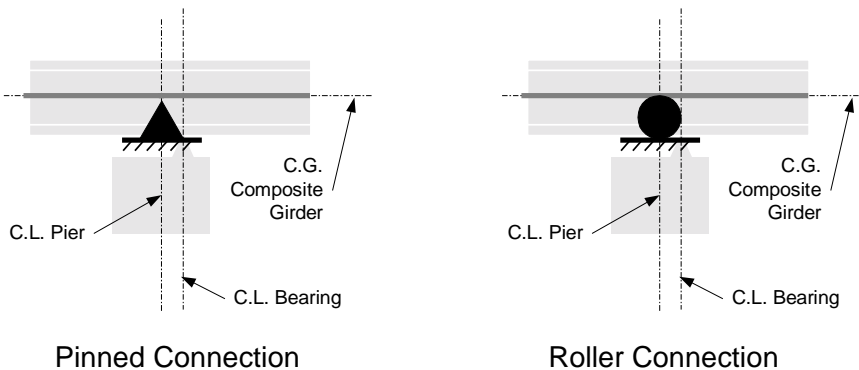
Continuous Pier Connection on a Zero Height Idealized Pier
